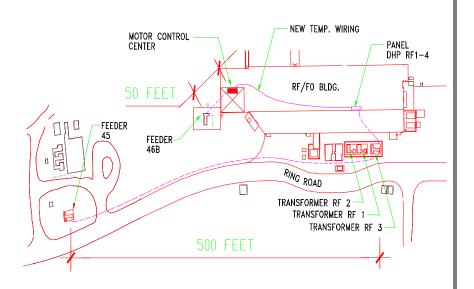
Layout of F-Zero Building and Electrical Systems
